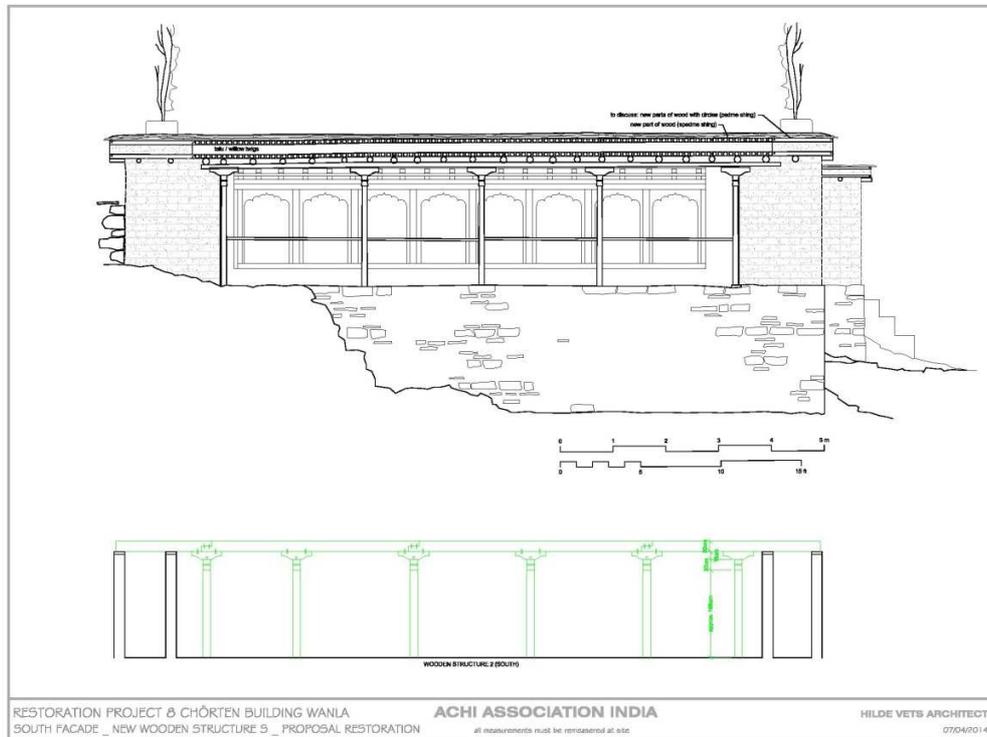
Restoration proposal: south façade and new wooden structure (in green), dd april 2014 (drawing: Hilde Vets)
